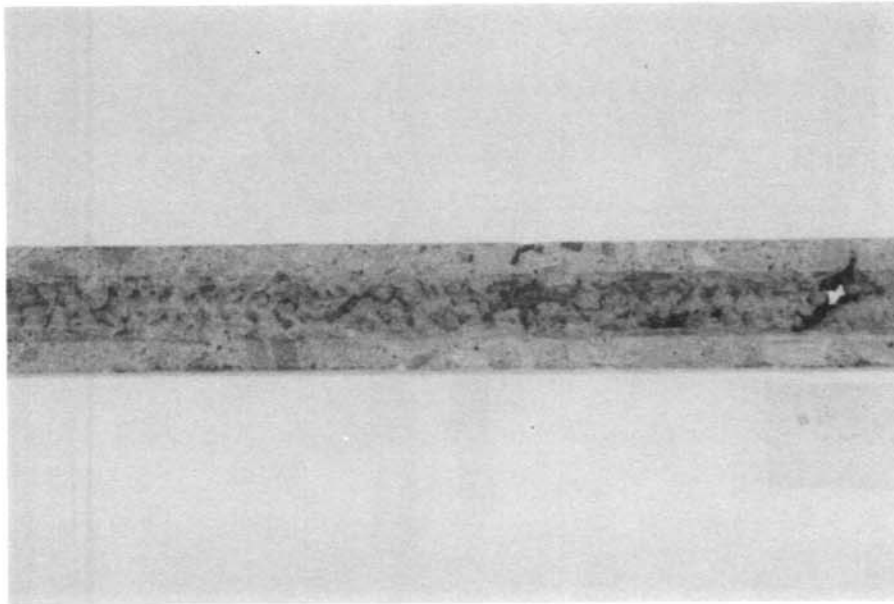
Concrete removed from below transverse reinforcement on Sample No. 12. Note hole and voids beneath reinforcement.
